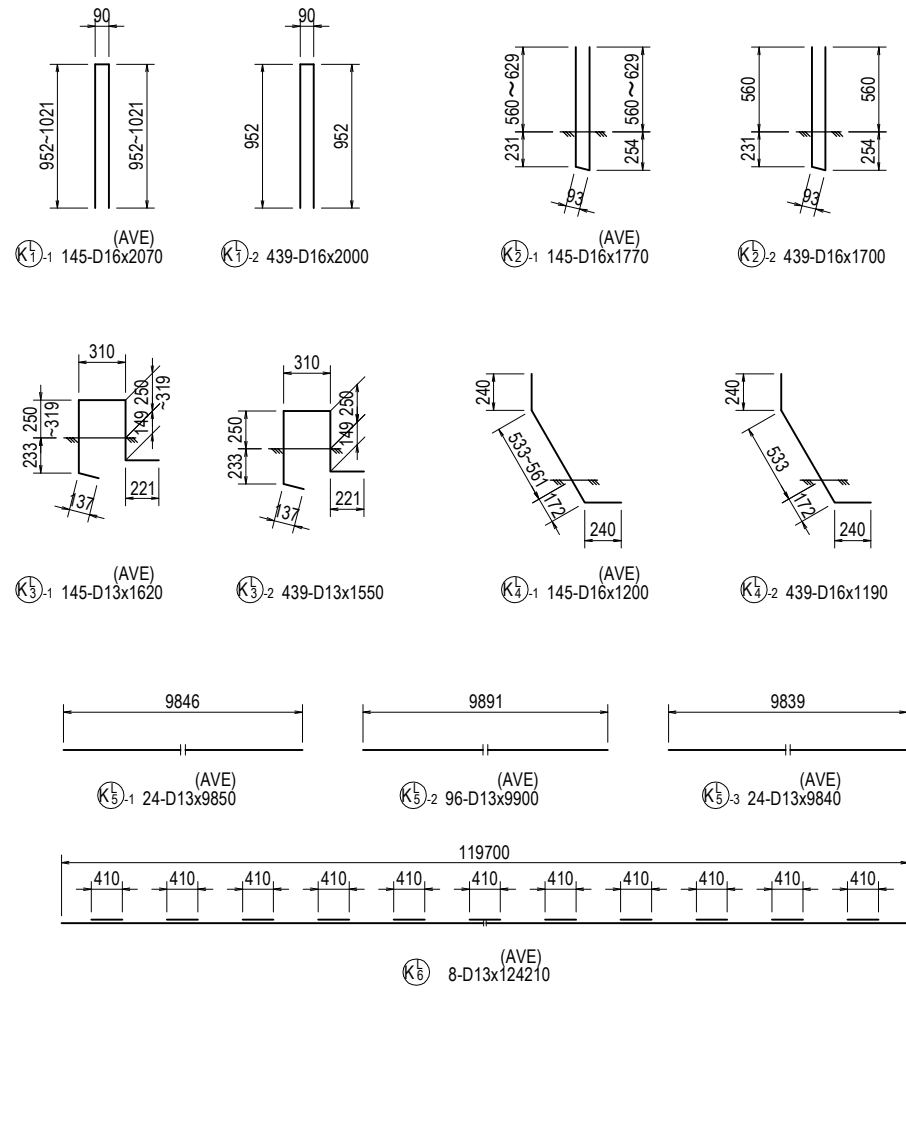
# DETAIL OF CONCRETE CURB, BARRIER AND MEDIUM (PF7-PF11) (2)
